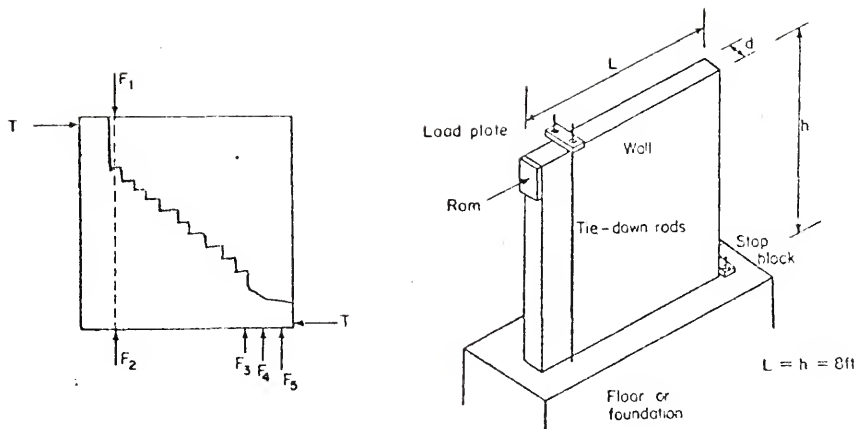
Arrangement of racking test and the force distribution on the specimen.
